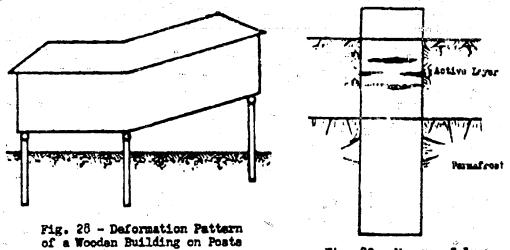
Masonry Column Failure Due to Heaving
